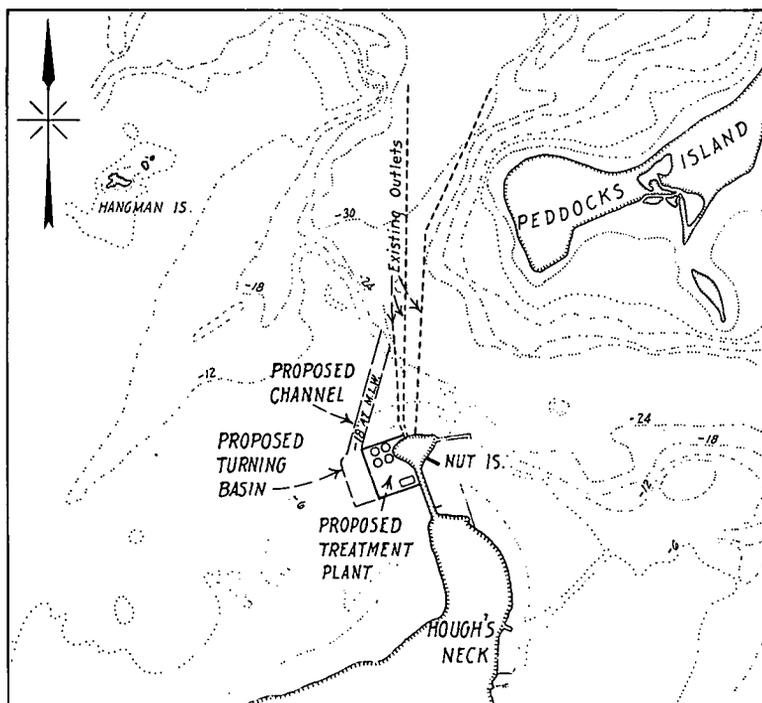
LOCATION PLAN OF SEWAGE TREATMENT PLANT AT NUT ISLAND
